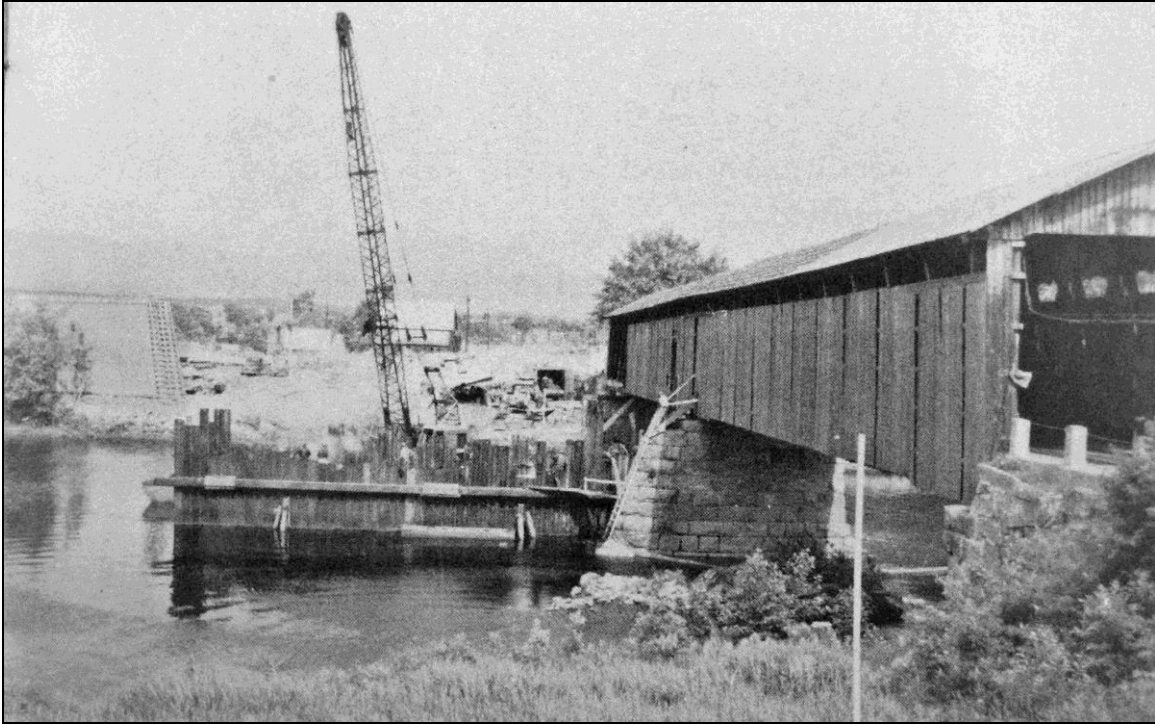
Rogers Rangers Bridge, under construction July 1950, from Vermont side, showing construction of steel sheet-pile cofferdam for concrete pier, and existing covered bridge on downstream side. Note pier formwork prebuilt on New Hampshire side and white stake in foreground marking south corner of west abutment (*New Hampshire Highways*, August 1950).
